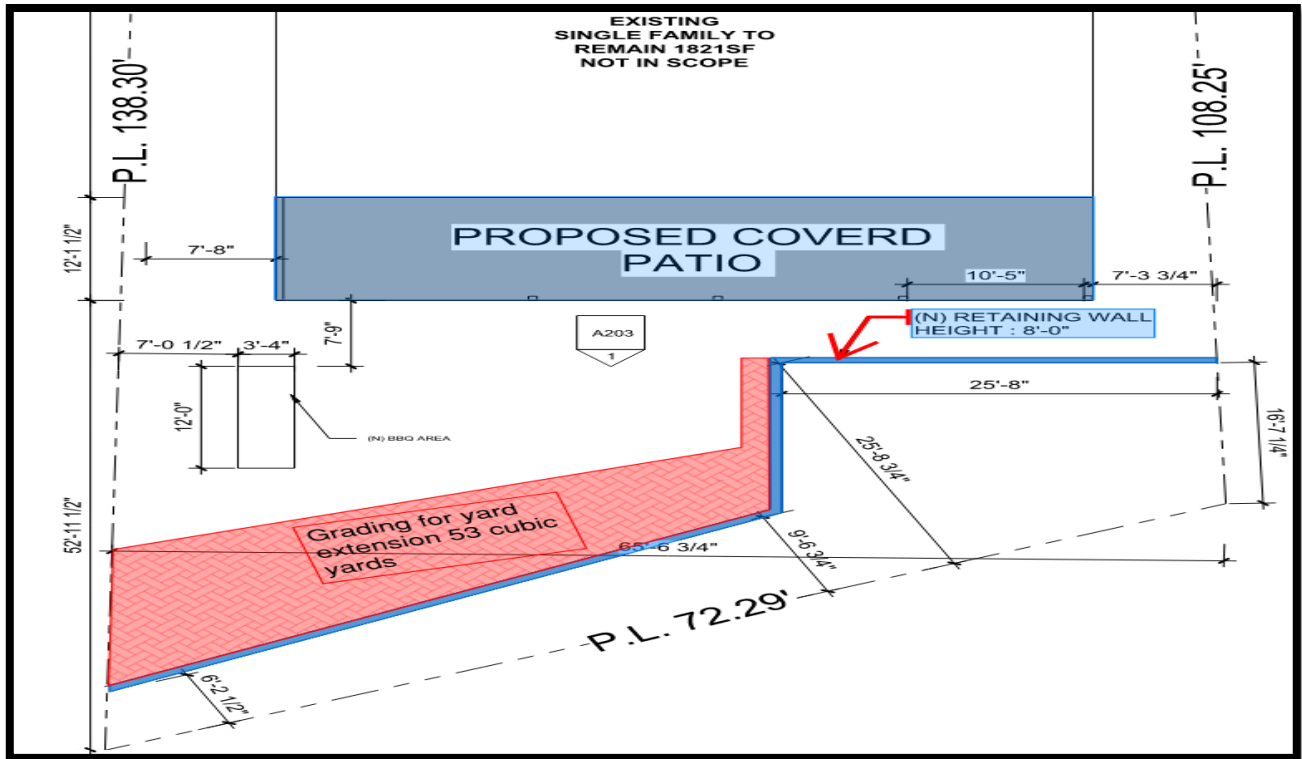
Site plan of the proposed Project, which includes the new patio cover shown in blue, grading activity for the rear yard area expansion, and new rear retaining wall ranging in height of 5'-0" to 8'-0".
